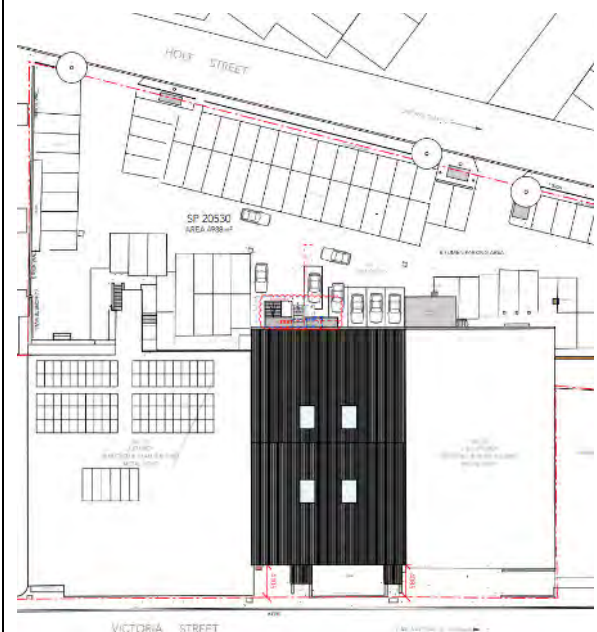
Amended site plan with linear ramp dashed in red deleted and new stairs and proposed lift in grey, DA 00 Rev B
